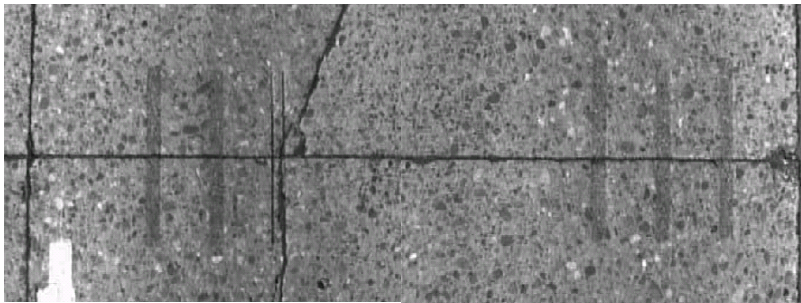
Dowel bar retrofit slot cut but not retrofitted to avoid longitudinal crack.
